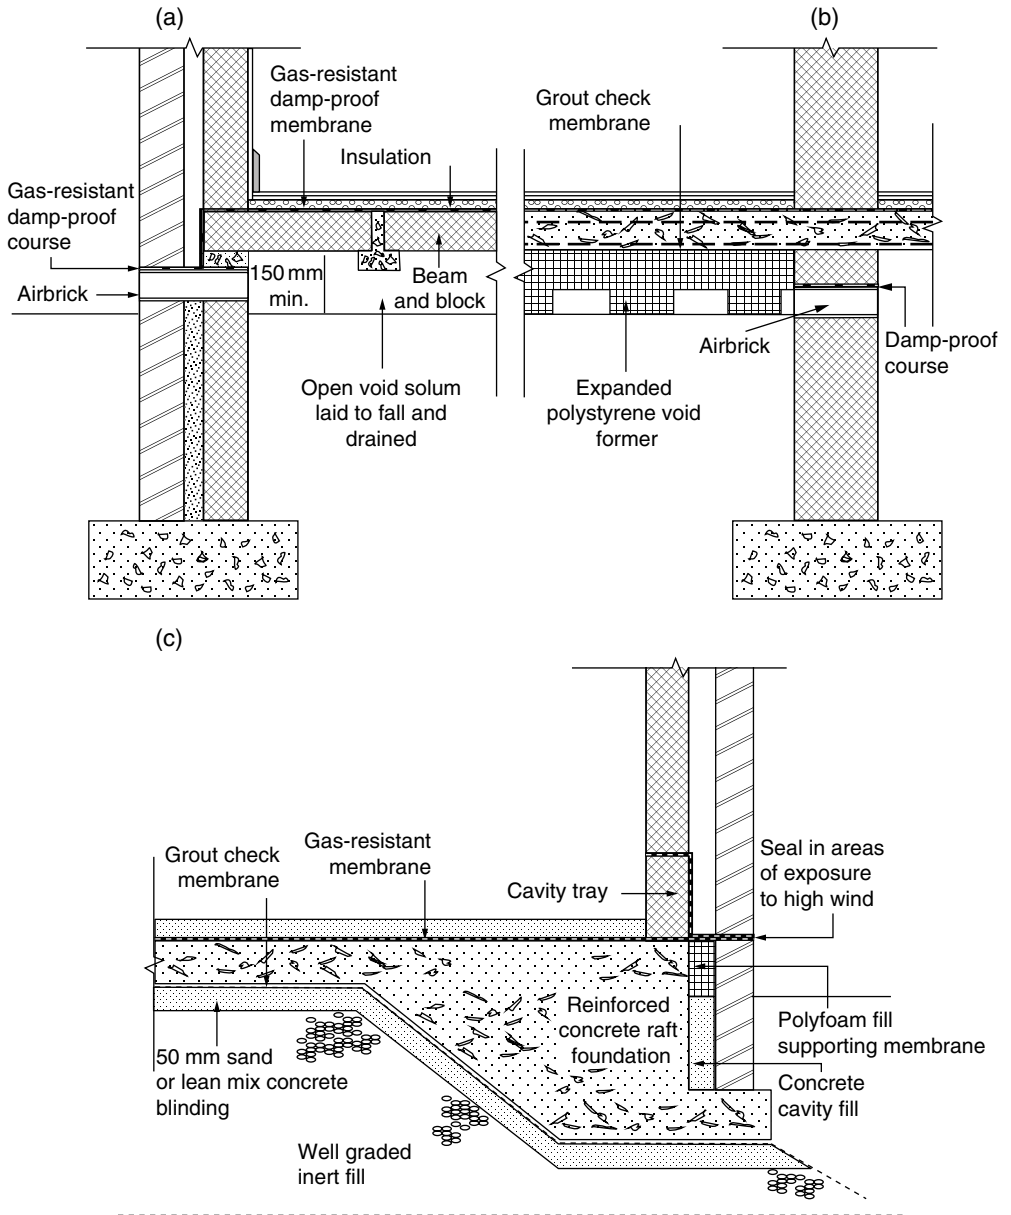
Landfill gas protection details. (a) Beam and block floor with open void. (b) In situ slab with EPS void former. (c) Raft foundation with membrane on top of slab.
